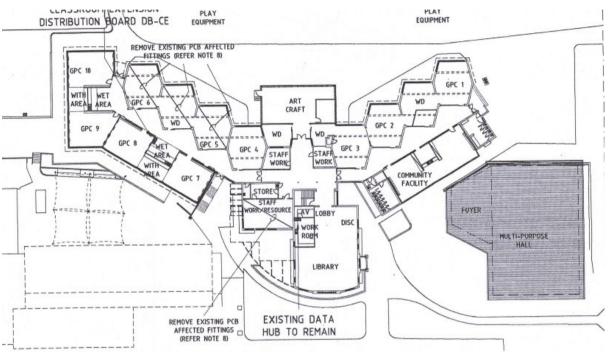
Floor plan showing the eight original hexagonal classrooms and circulation corridor behind. GPC7-10, library, staff work/resource room, community facilities and art craft space are all later additions. (Source: BP 2580)
